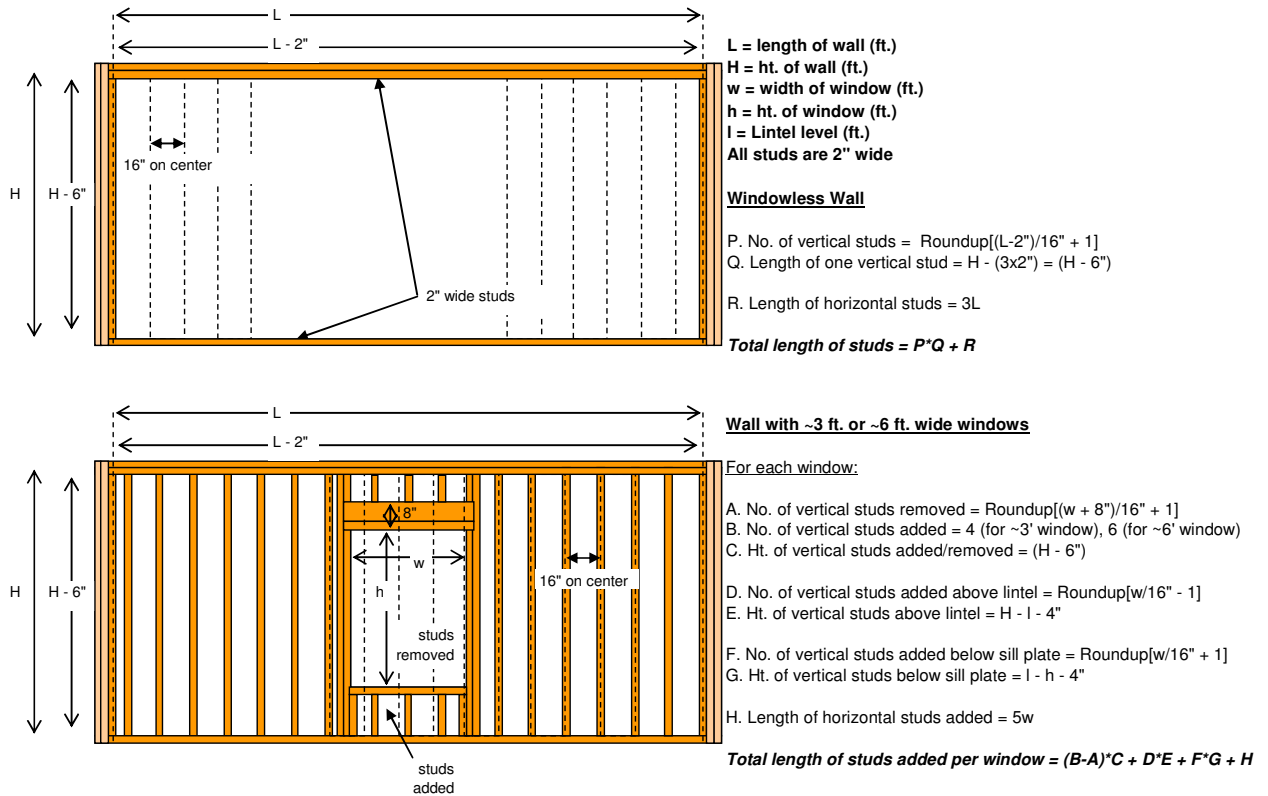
Calculation of Stud Area for a Typical Exterior Wall without and with Window Openings
